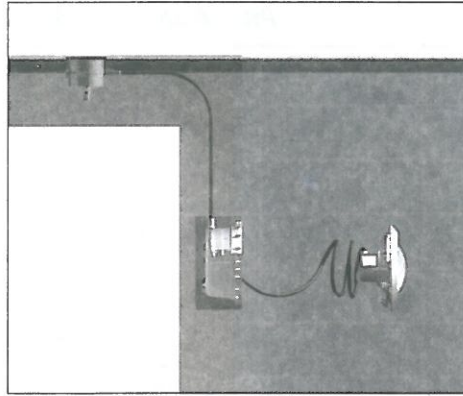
Concrete pool / Piscina hormigón / Beton havuz
